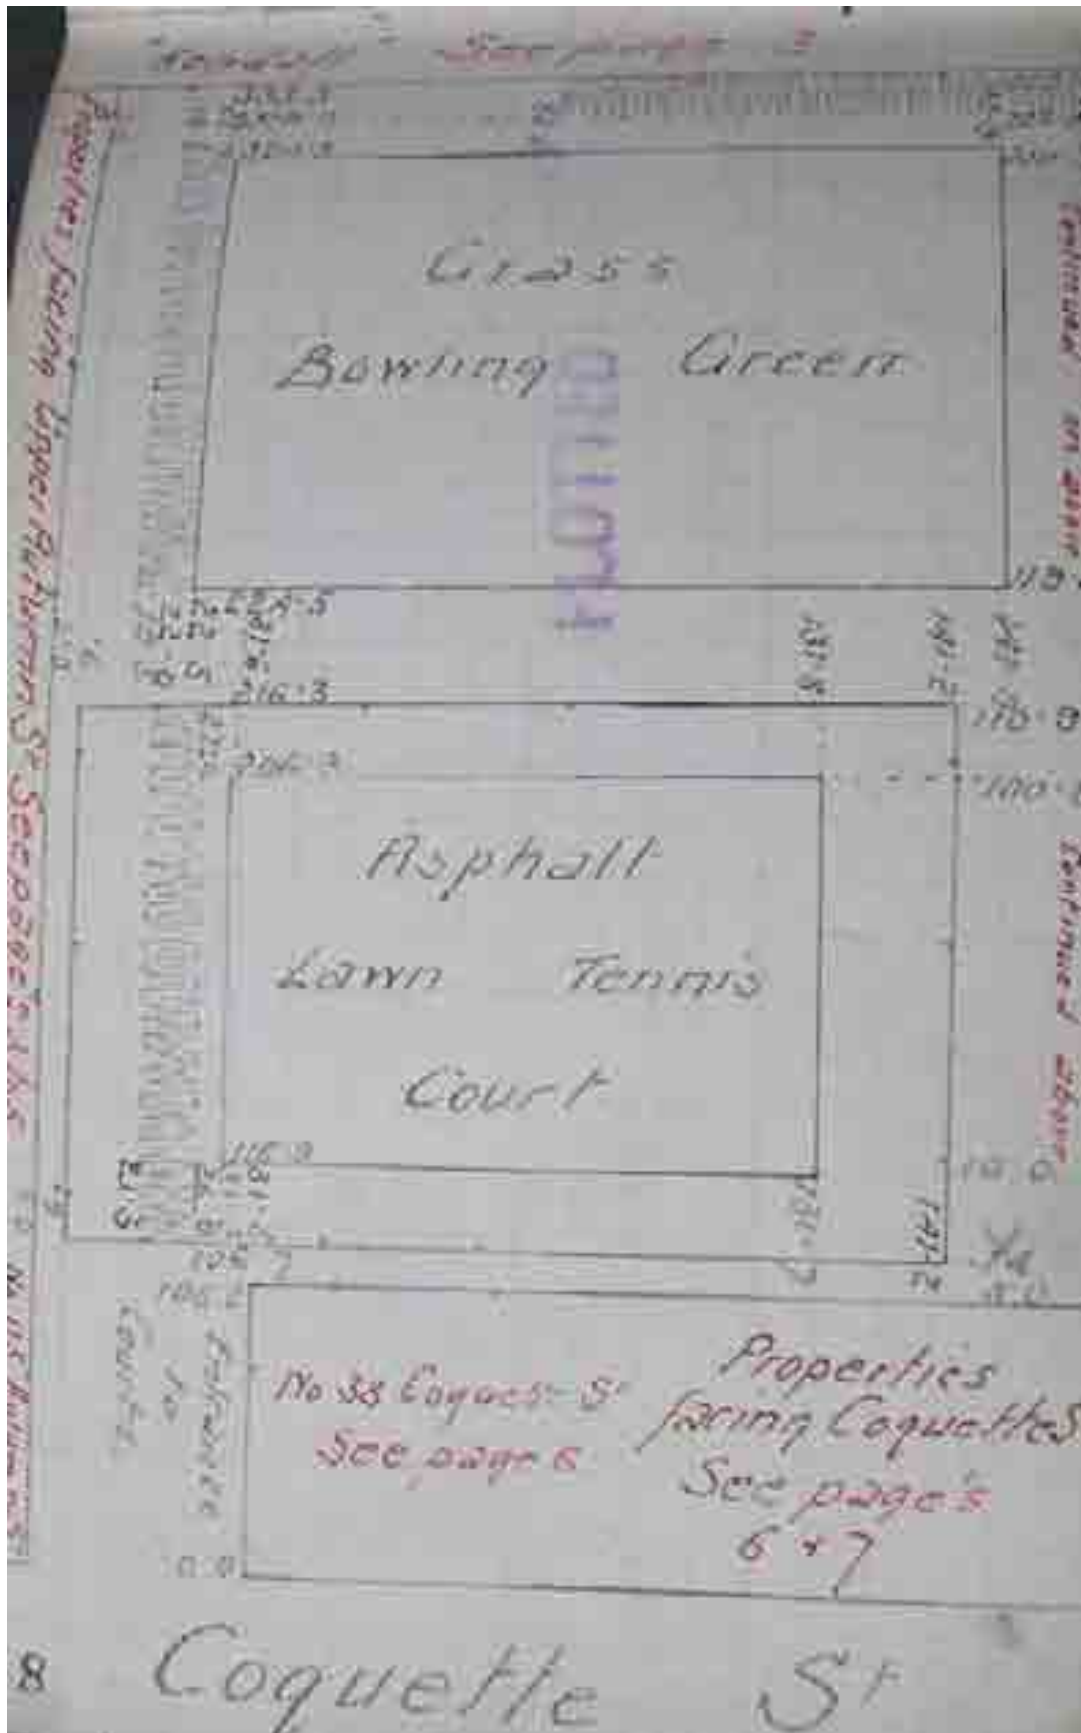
Sketch plan showing the Geelong West Bowling Green & Tennis Court, c.1912. A second sketch plan showed the location of the quoit ground. Source: Geelong Waterworks & Sewerage Trust Fieldbook, no. 163, p.8, c.1912, Barwon Water collection.
